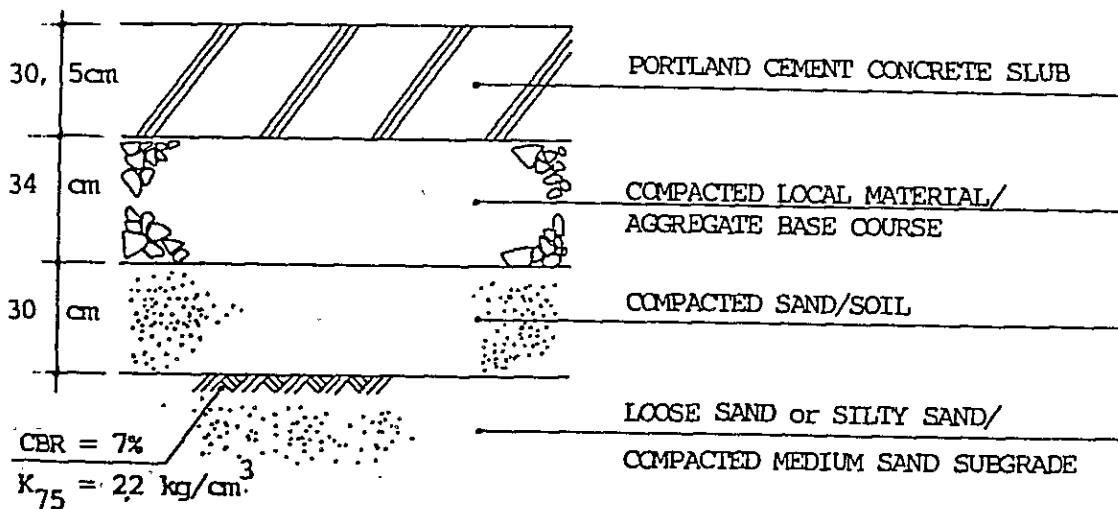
EXISTING RUNWAY PAVEMENT STRUCTURE
